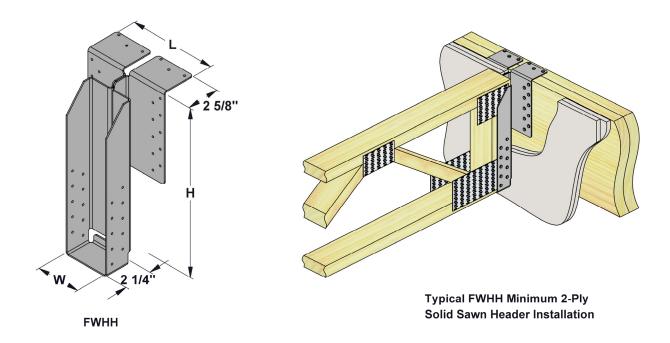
FWHH HEAVY-DUTY FIRE WALL HANGER AND TYPICAL INSTALLATION ON SOLID SAWN HEADER
